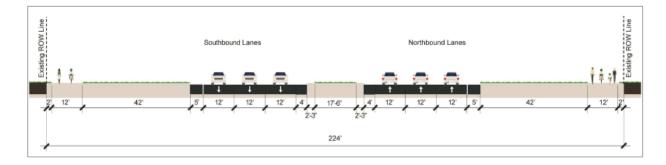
Alternative 1 – Rural 6 Lane Widening with Shared Use Path
